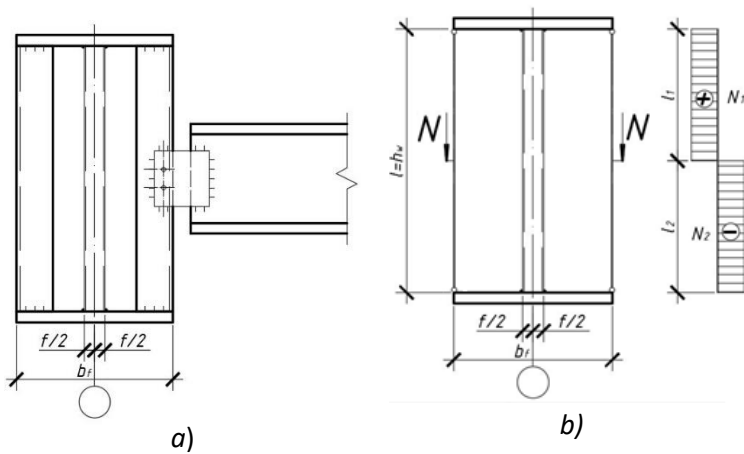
To the design of the connection a secondary beam with the corrugated sin-beam via transverse cross brace: a) diagram of connection joint; b) design diagram of cross brace
